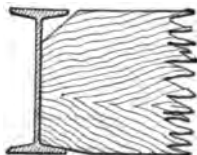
Framing I Beam and Wooden Beam of Same Depth
